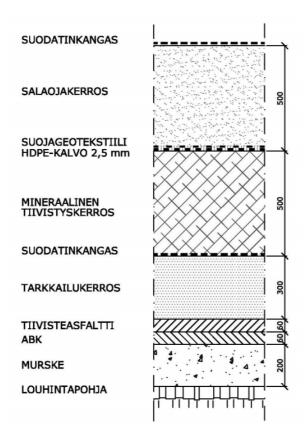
Foundation structures in the landfill at Ämmässuo (From bottom: excavated rock, crushed rock, additional asphalt sealing layer, additional drainage layer to detect leakages through the mineral sealing layer, geotextile filter, mineral sealing layer, HDPE geomembrane, geotextile protective cover, drainage layer and geotextile filter (reproduced from Samposalo 2008).
